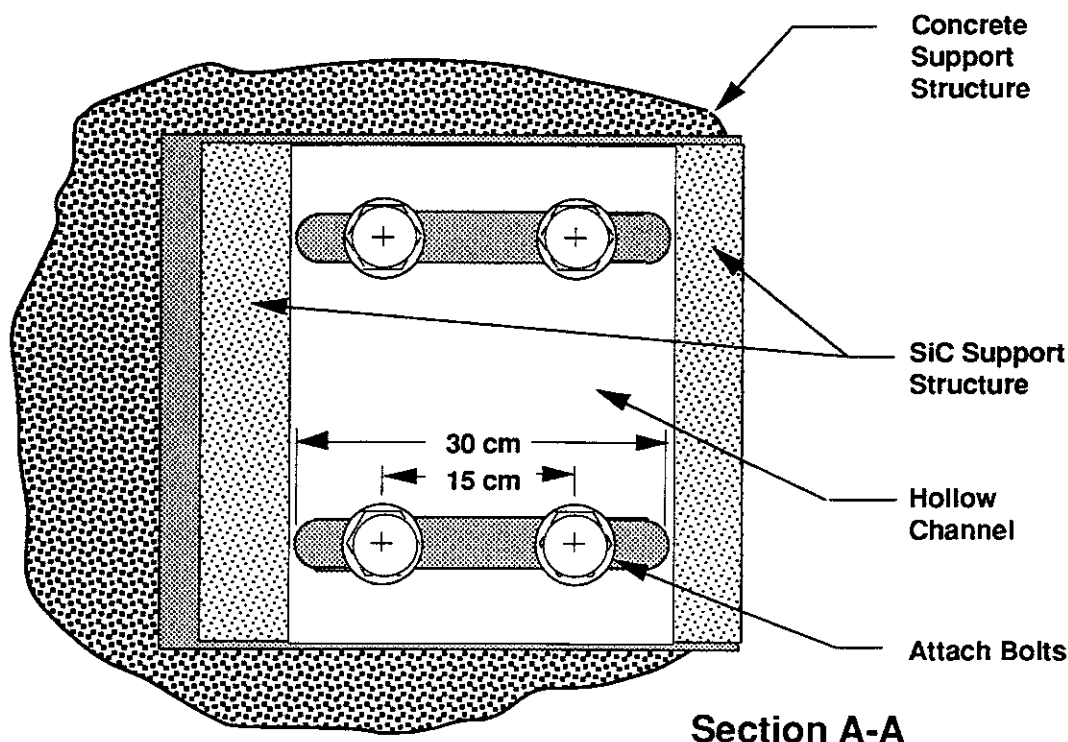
Detailed Cross-Section of GIMM
